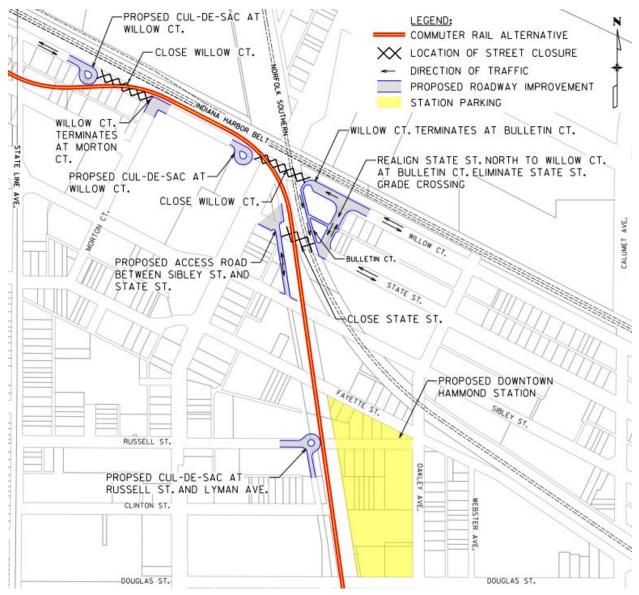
Commuter Rail Alternative Proposed Street Closures
